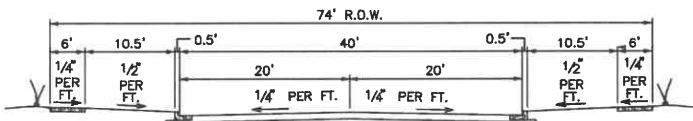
TYPICAL STREET CROSS-SECTIONS
